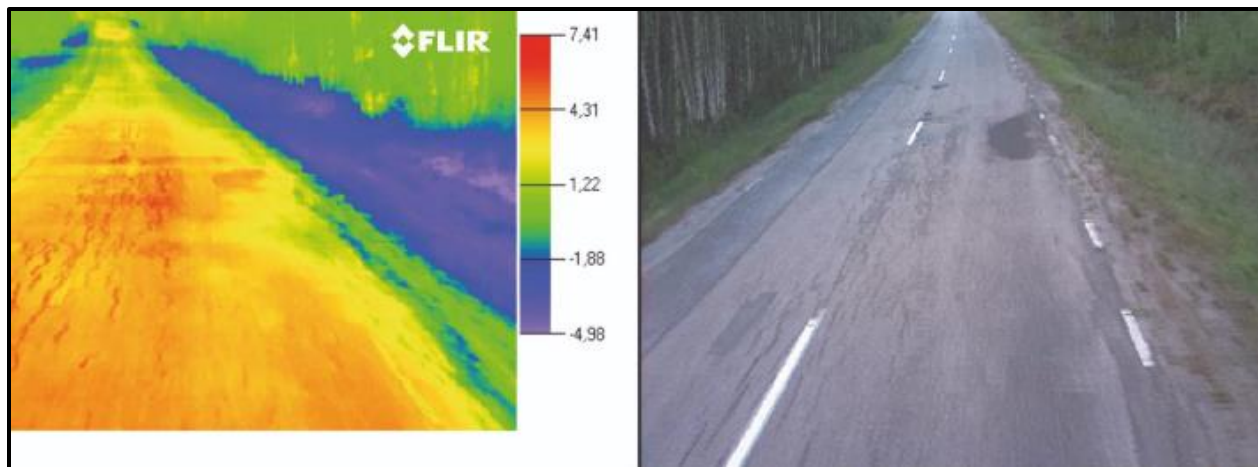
Thermal pavement surface image (Heijnsman, 2014)
